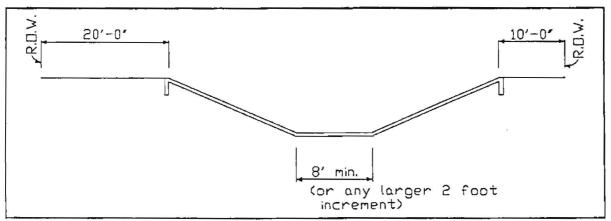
Typical Section - Concrete-Lined Trapezoidal Channel
